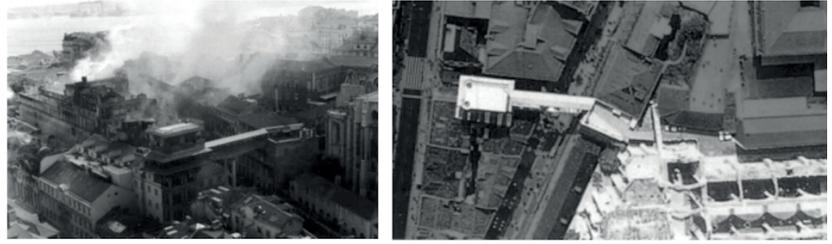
Photo of Elevator de Santa Justa and Chiado in fire (up).
